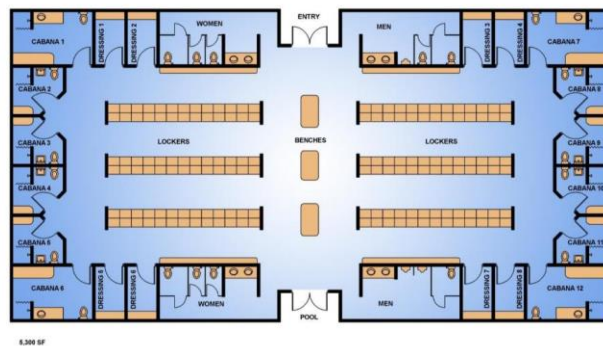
Example of Best Practice Floor Plan of Family Locker Room
